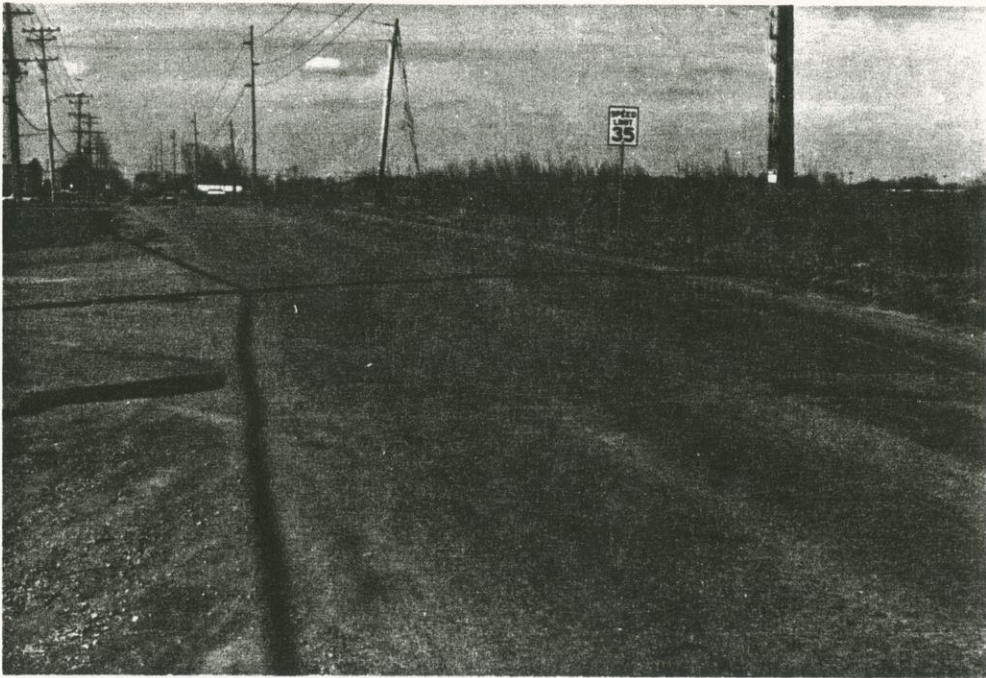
Looking north along existing Raywood Road showing subject's industrial zoned area to right of roadway.
